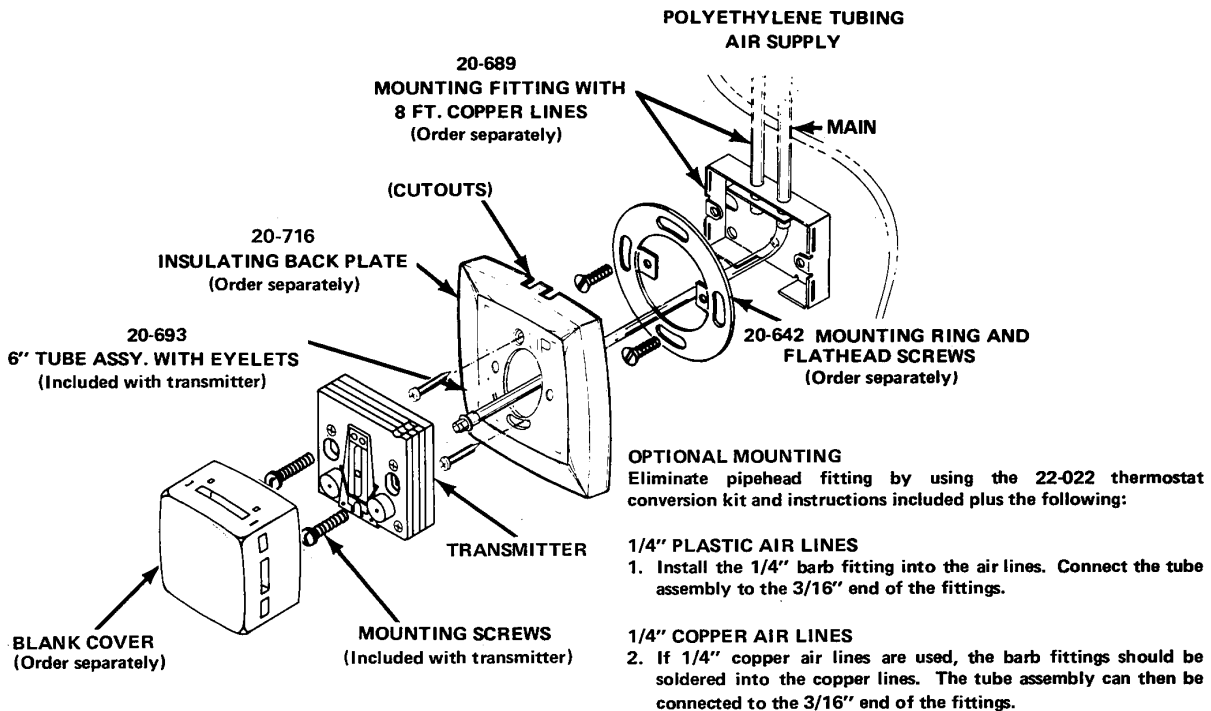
Typical 2220-053 Surface Mount, Pipehead Application.
